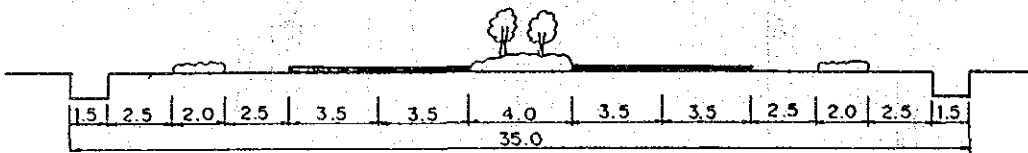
(A-u) Road and Bridge Sections (Unit; m)
